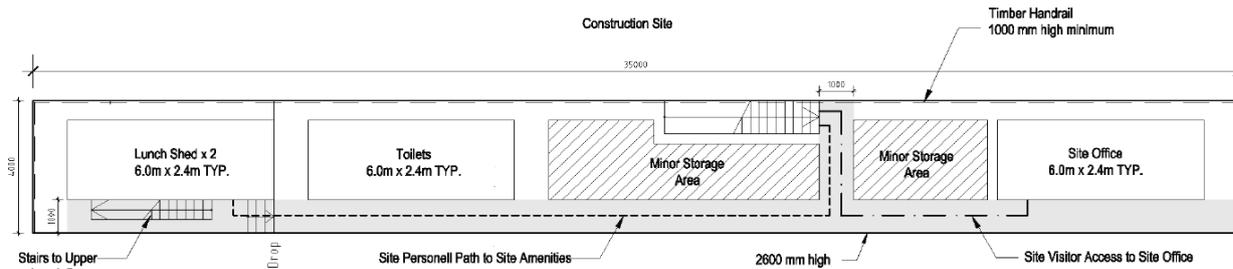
Typical Site Plan for Type B hoarding with Site Sheds
